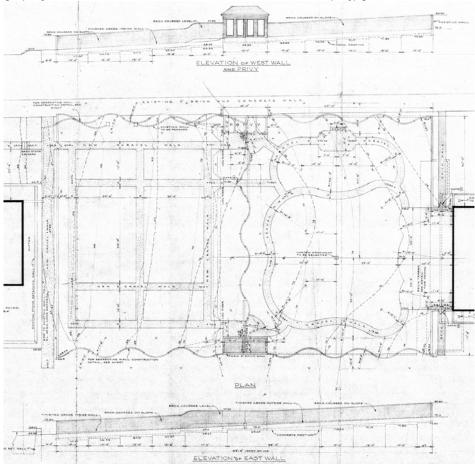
Pavilion I Garden layout drawing by Alden Hopkins establishes the character of the space in two distinct, brick wall edged chambers. (R-JAV-FMRC-FF-1950-03-33871-M-3-Pav1LayoutGrading.jpg)
